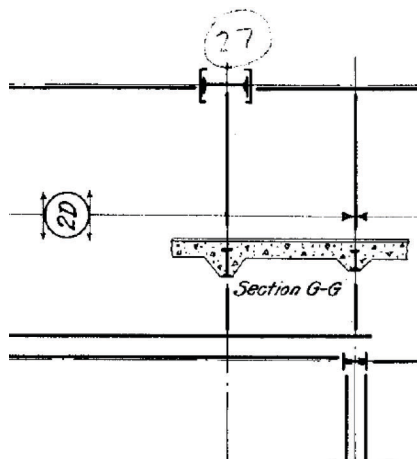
Close-up detail of column 27 encased in concrete (partial plan view from original drawings), and beam-column connection with rivets through angle on beam bottom flange and web.
